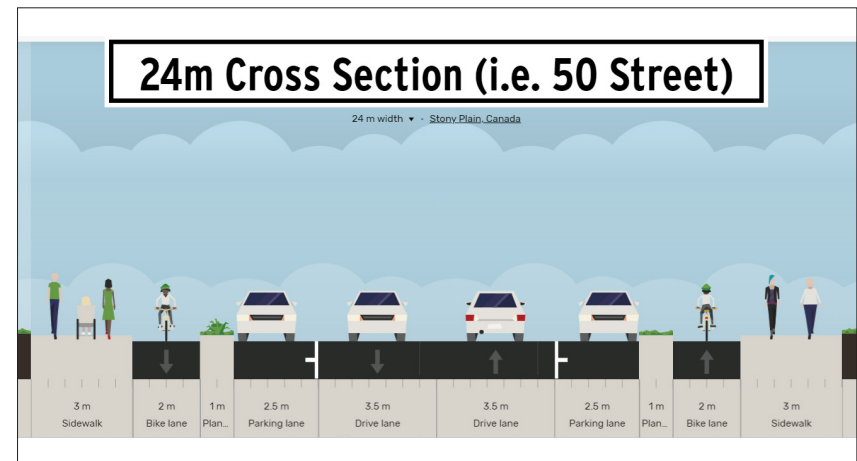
EXAMPLE CROSS SECTION FOR 50 STREET BETWEEN STREET BETWEEN 50 AVENUE AND 49 AVENUE
